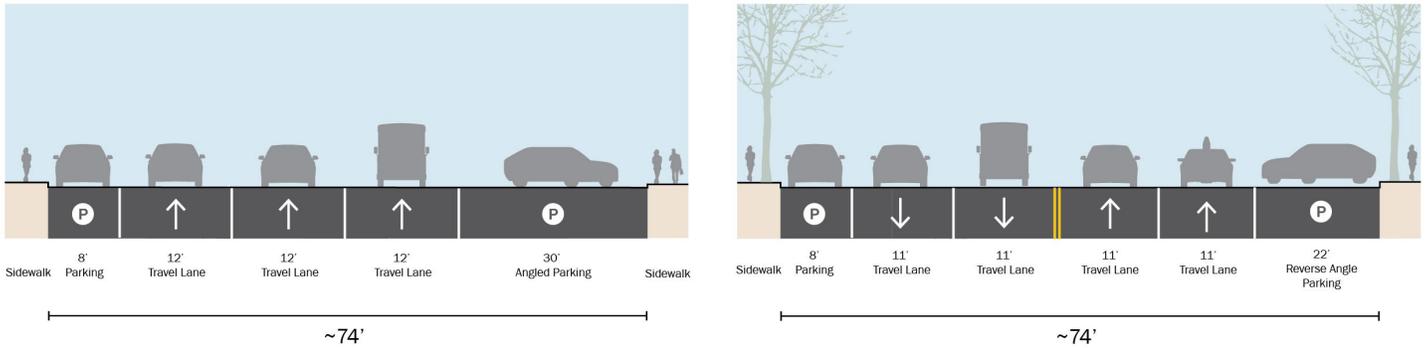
Existing and Recommended Cross Section of Lincoln Park between Clinton Avenue and Broad Street (looking north)
